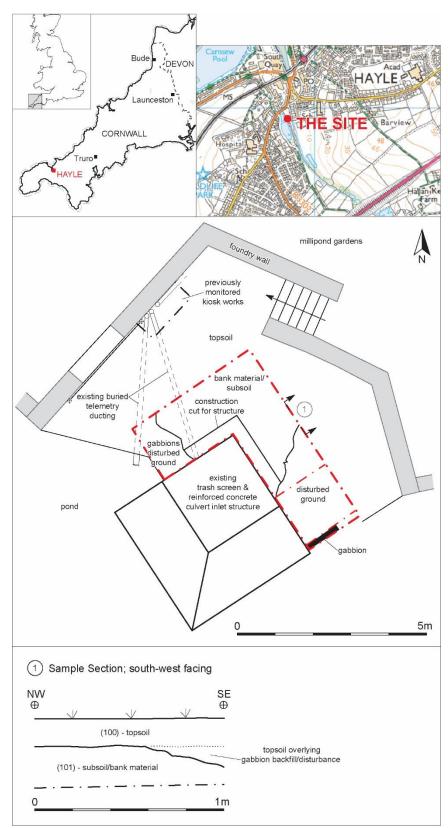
SITE LOCATION, PLAN AND SECTION DRAWING.
